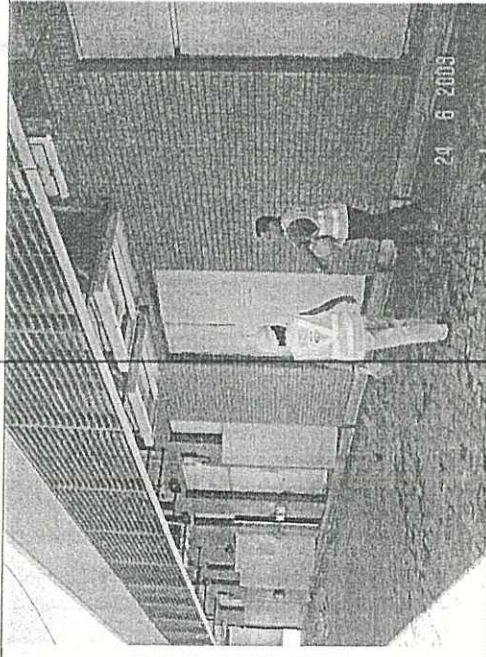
Equipment Rooms at Prince Edward Ventilation Building
